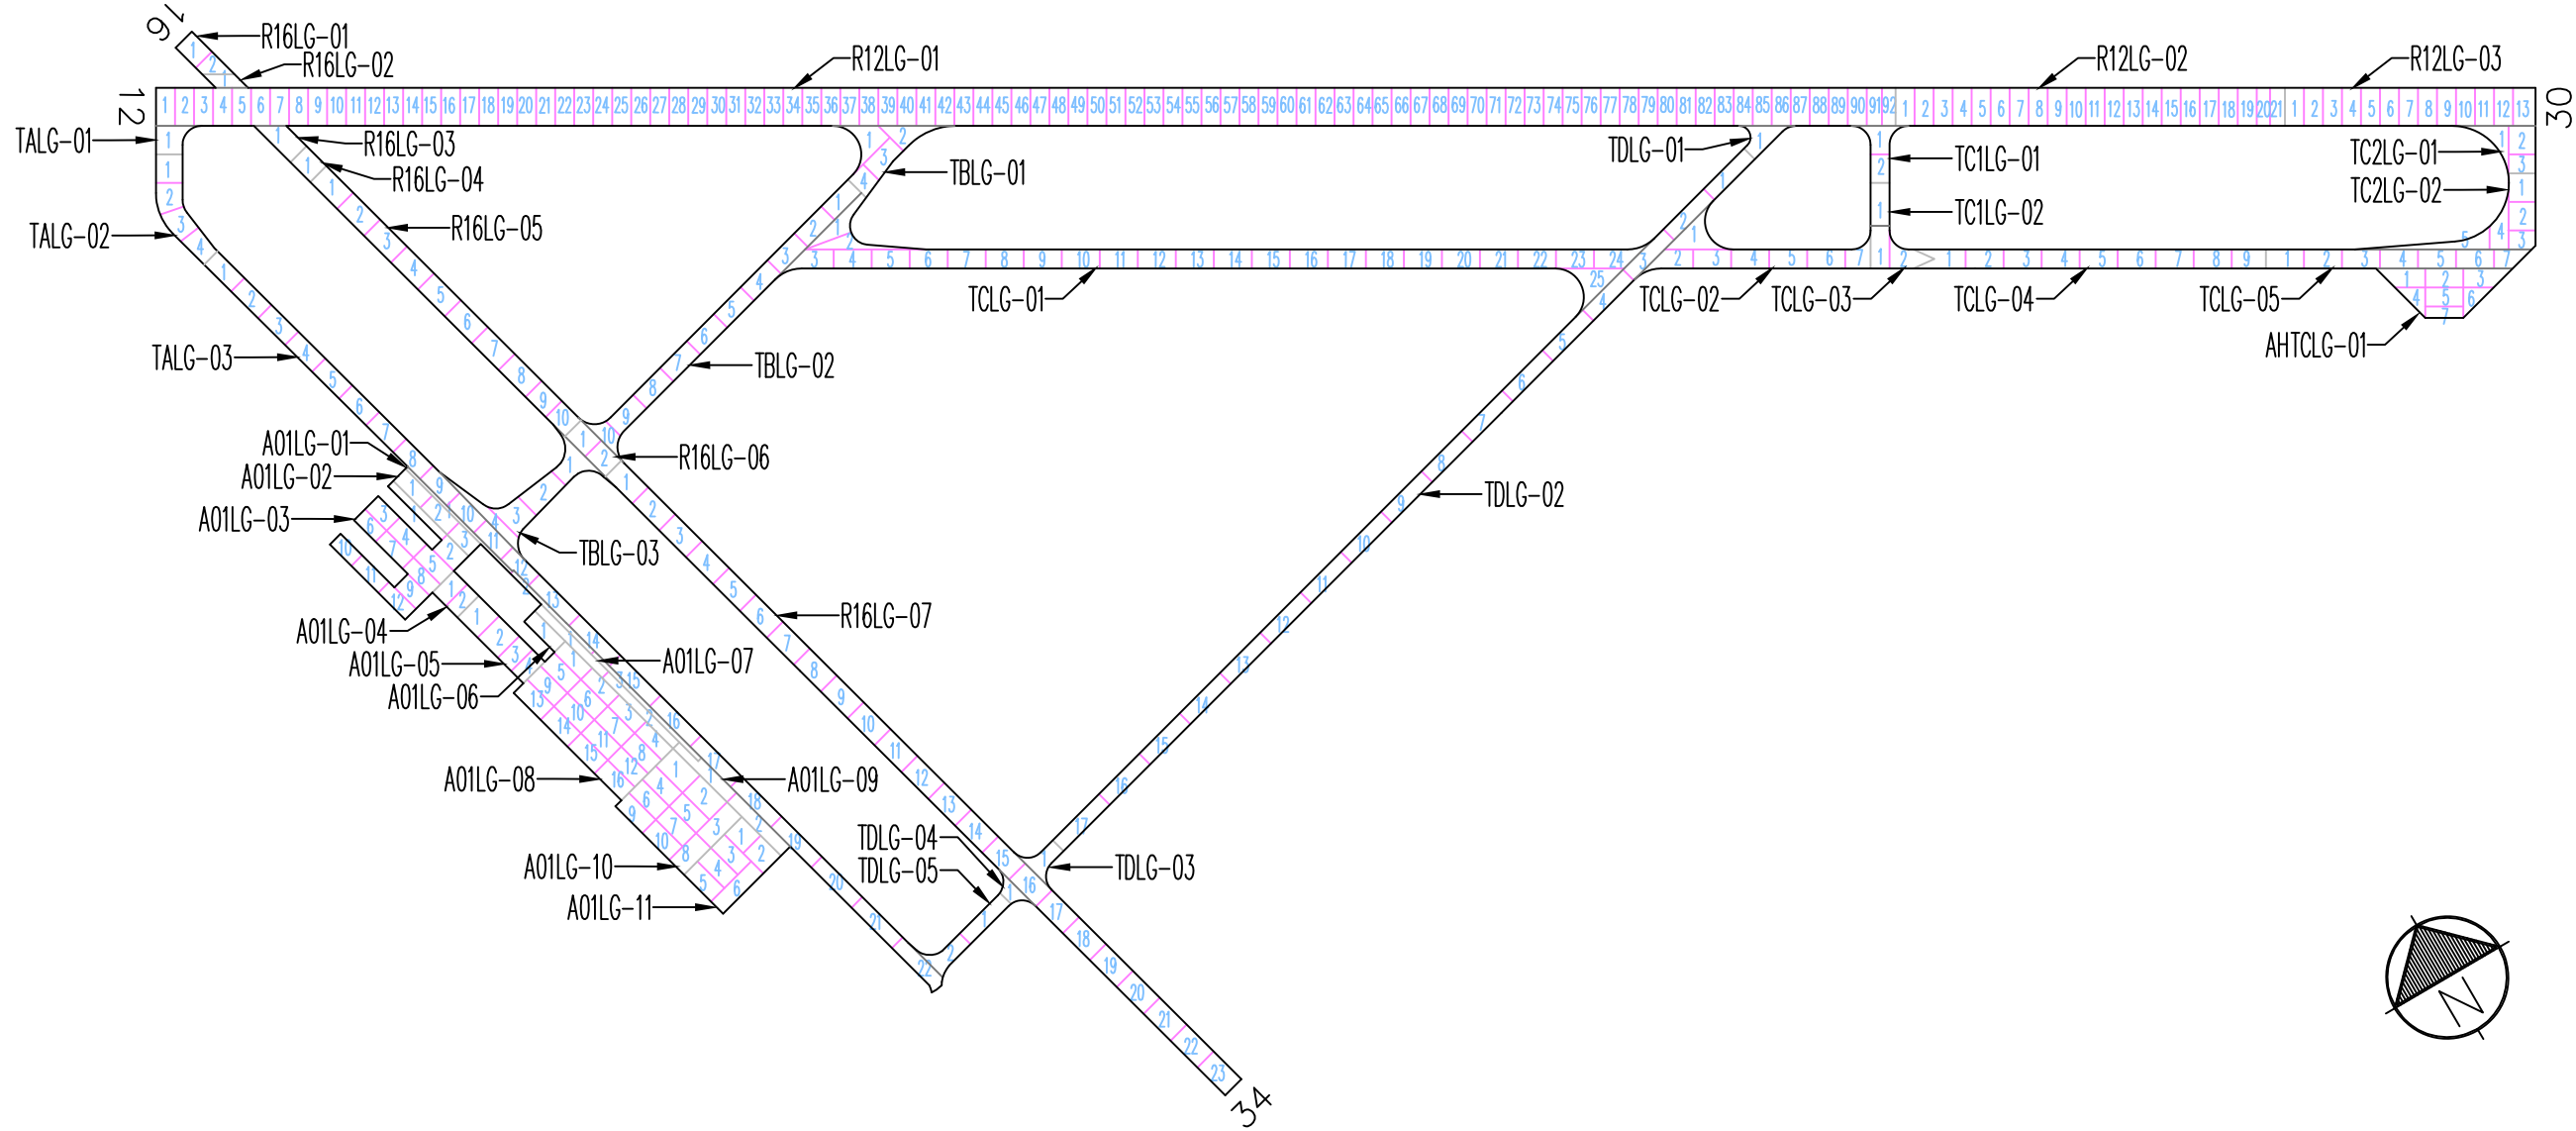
Pavement Branch, Section and Sample Unit Layout.
